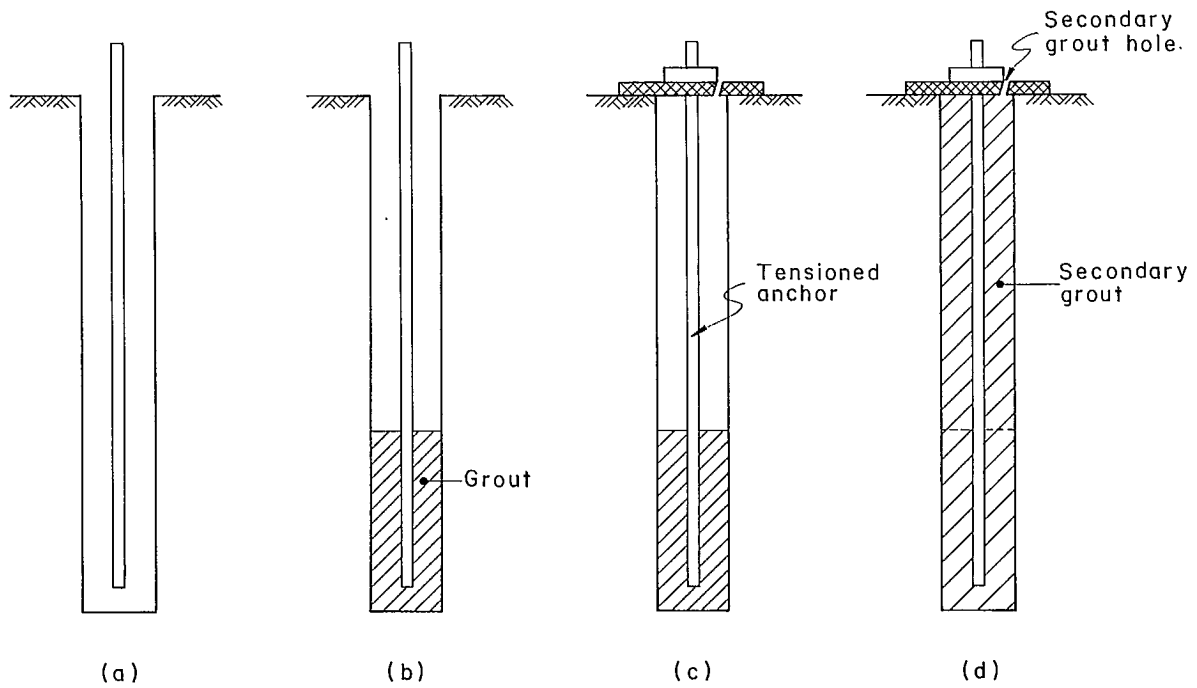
Steps in installing a fully grouted anchor: (a) anchor inserted in hole (b) bottom grouted (c) anchor tensioned and clamped (d) remainder of hole grouted
